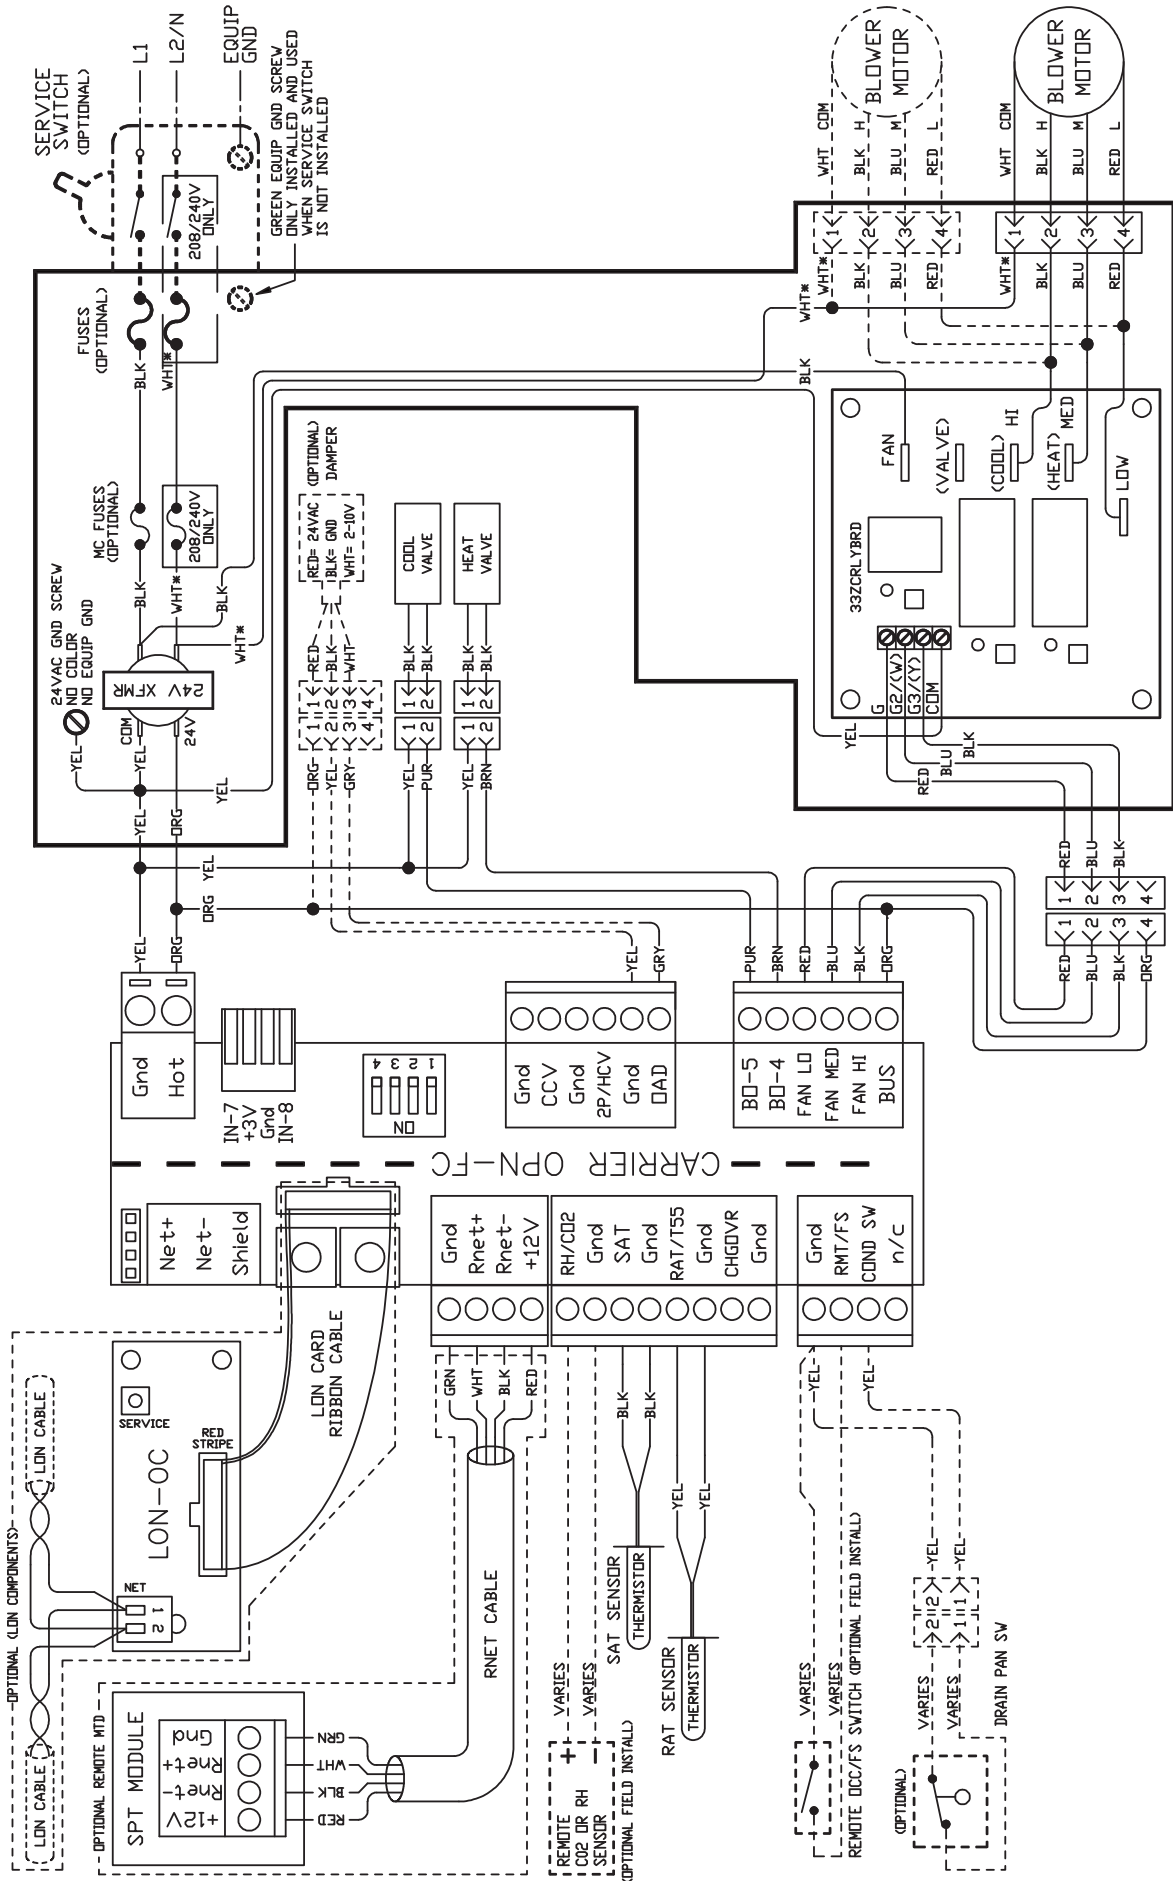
42D (1200-2000 cfm) 4-Pipe Heating and Cooling — Open FC Controller (24-v) with Motorized Control Valve (2-Position)
